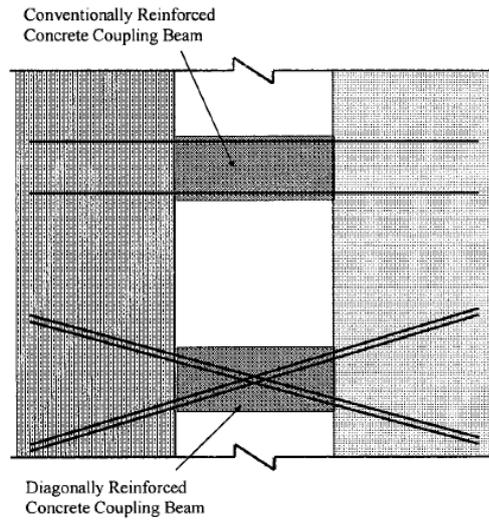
Rebar pattern for conventional and diagonal reinforcement coupling beams.
